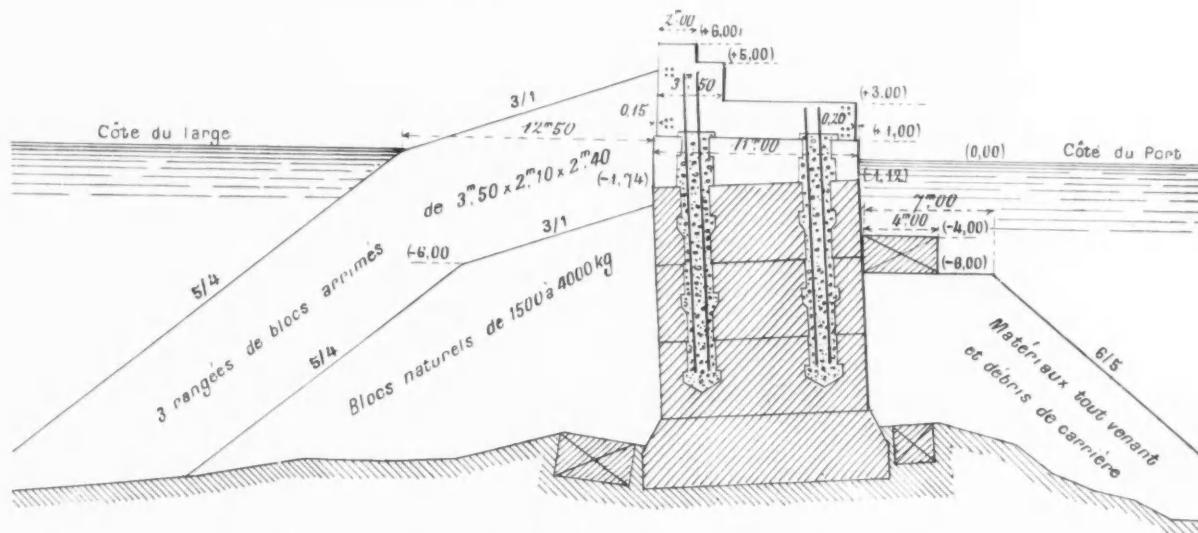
Type Cross Section between Chainage Points 610 and 695 metres.
